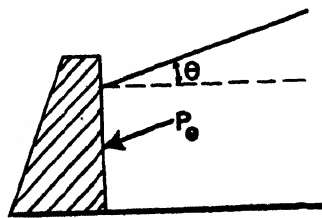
SECTION THROUGH AN ABUTMENT.
